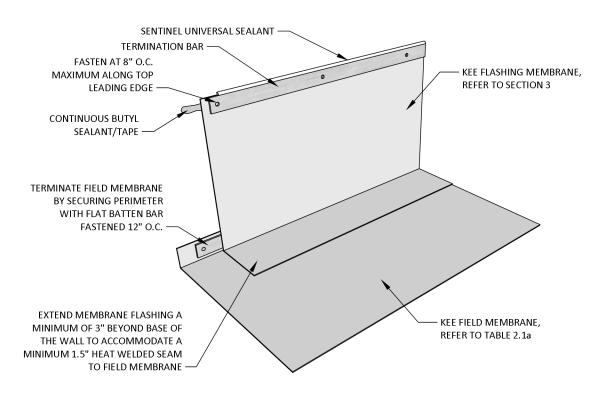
Adhered KEE Field Membrane at Wall/Curb with Vertical Perimeter Fastening
